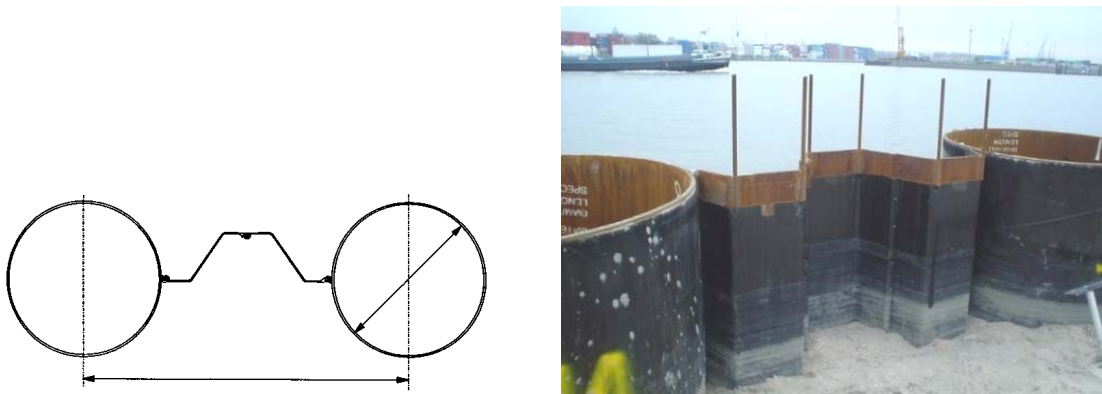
Schematic and photo of a combined wall of tubes and infill sheeting, also called CombiWall; the infill sheeting is connected to the tubes with welded slots
